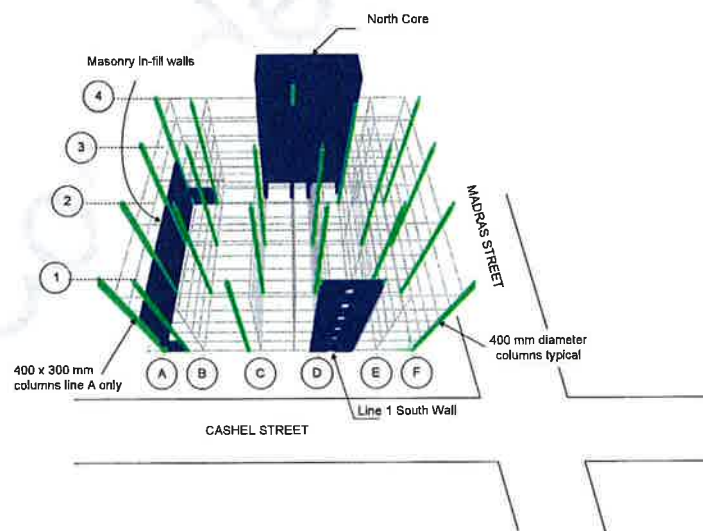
Building orientation and grid lines referred to in the report. (Note that this diagram is not to scale nor is the building positioned accurately relative to the roads)
